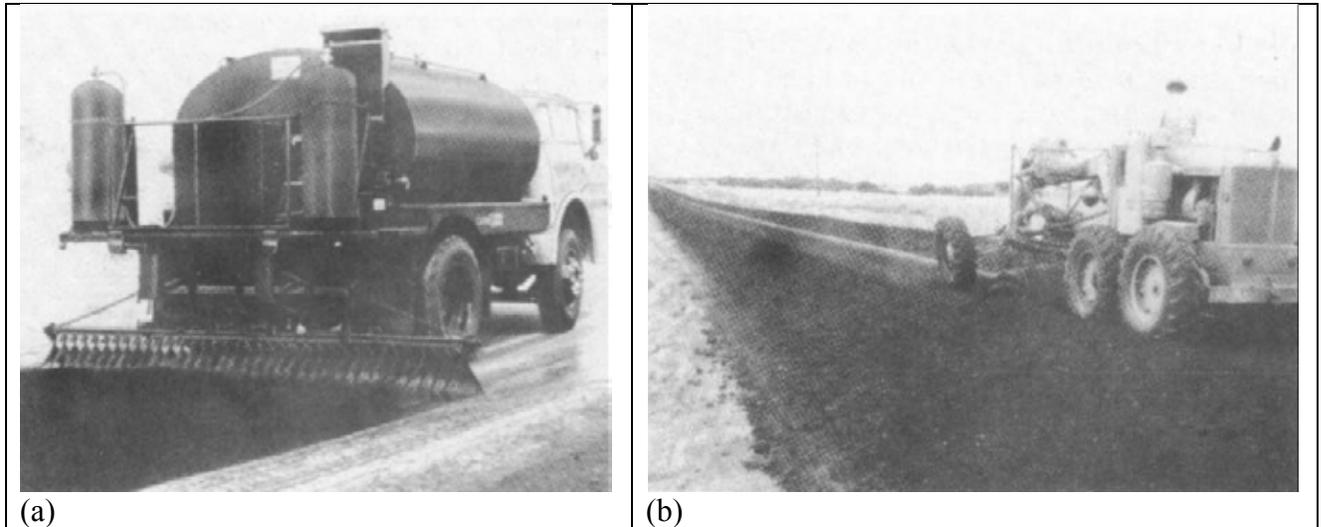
Steps for bitumen stabilization at construction site (a) Bitumen spreading (b) Bitumen mixing with soil (Photos courtesy of US Army Technical Manual [13]).
